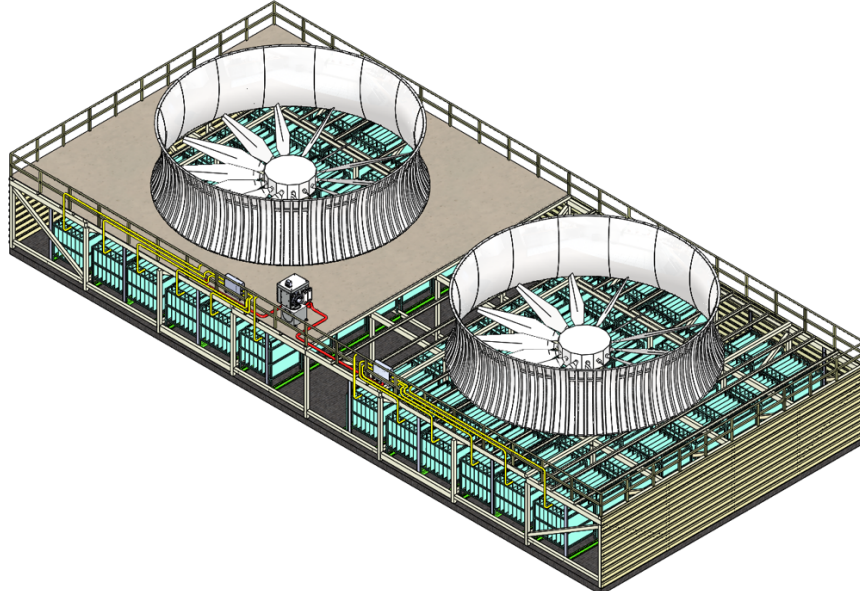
WaterPanel™ modules installed on standard 3-module FRP skid. Skids can be installed directly into cooling towers. Skid size selection depends on cooling tower structural framing layout
